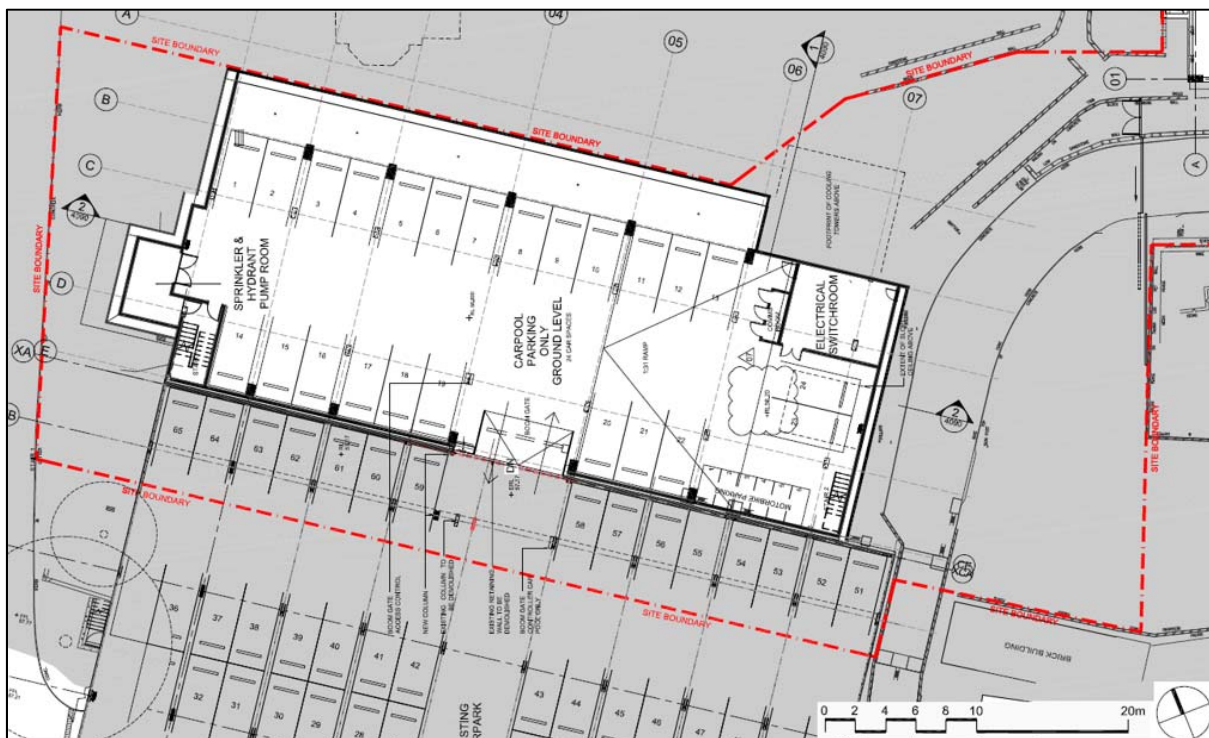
Proposed Bishopsgate Carpark ground floor extension (21 spaces) (Source EIS)
